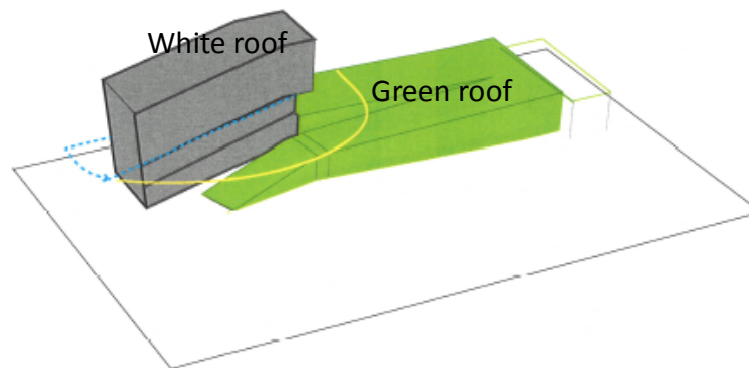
White roof and green roof defined for CoE building (Augustine, 2011)
